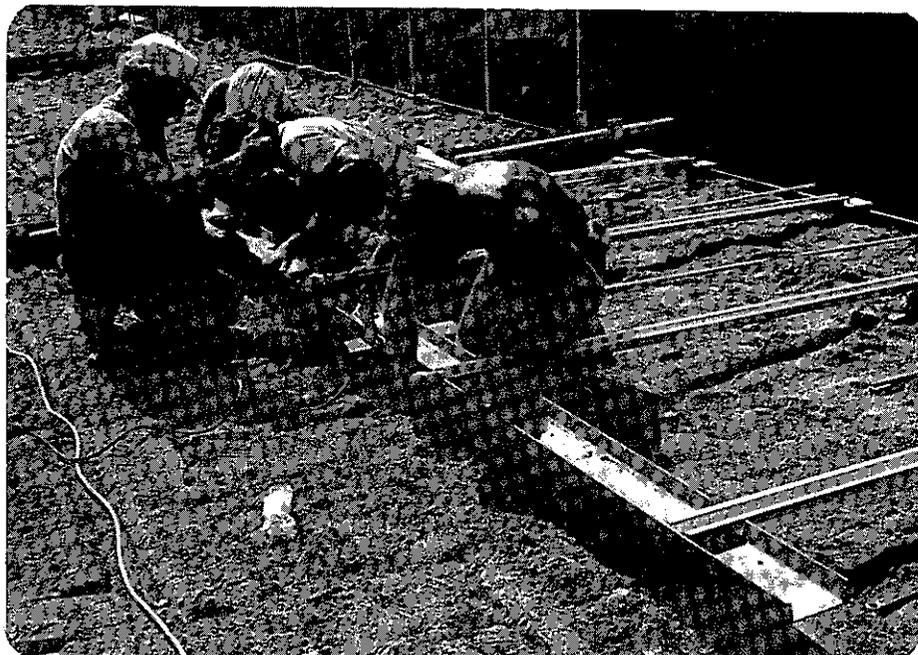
Laborers Attaching Tiebacks to Salvaged Channel Anchor
